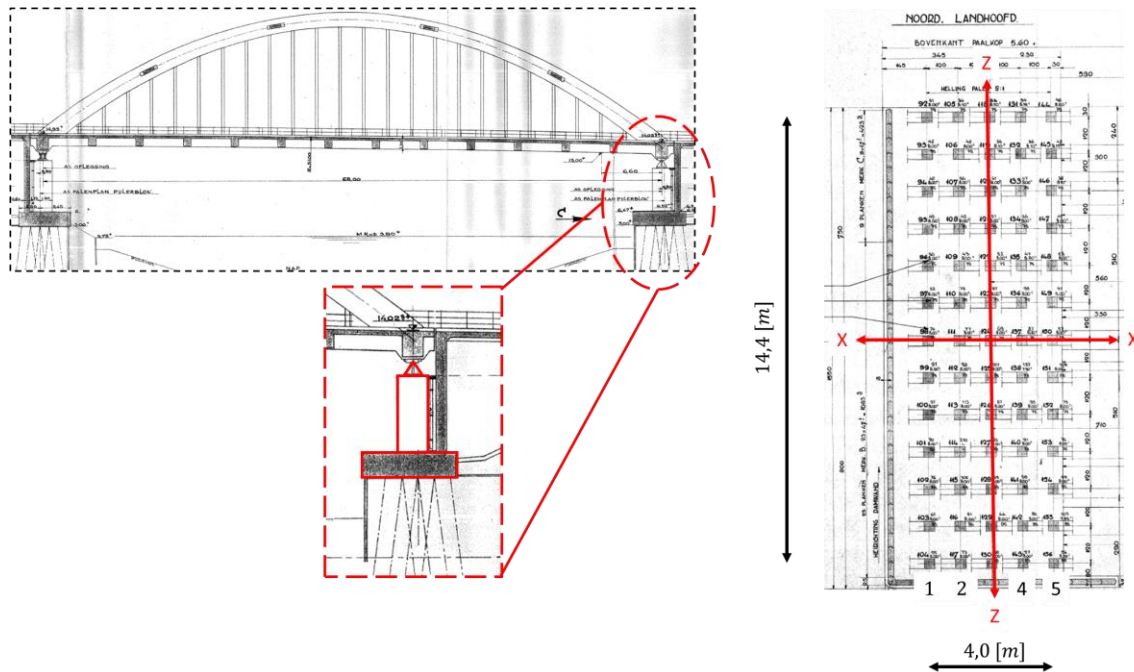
Abutment (left) and top view of the pile group (right) – Drawings B.5109 & B.3797 (from Rijkswaterstaat archives)
